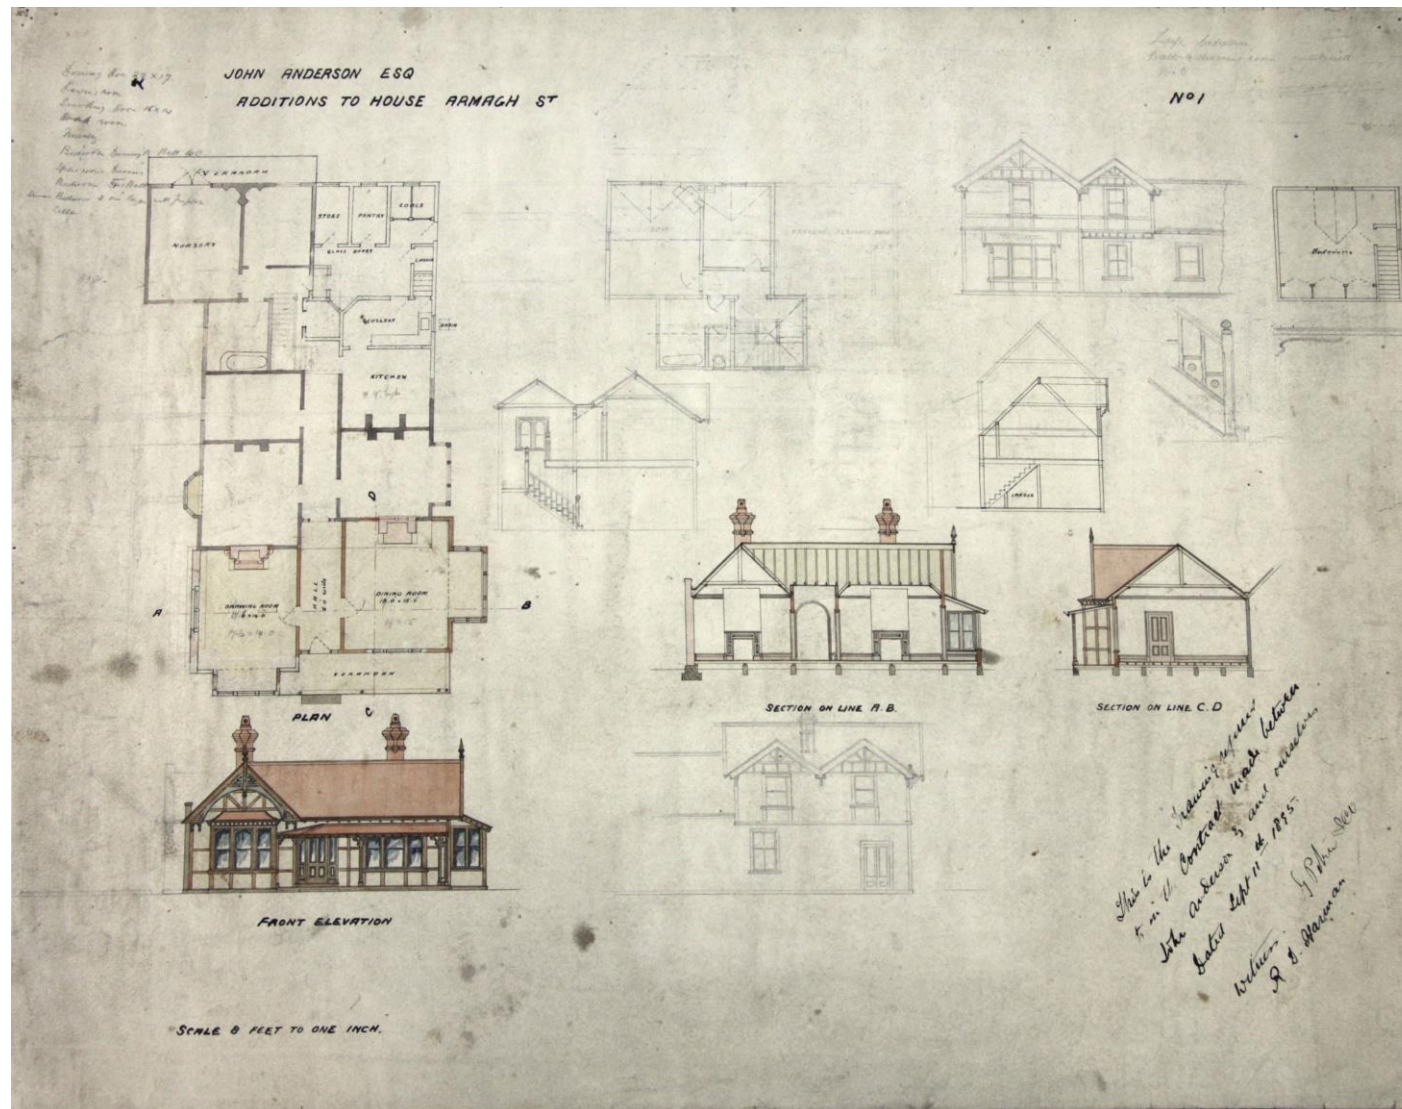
Collins and Harman, John Anderson, Esq., Additions to House, Armagh St., plan, elevations and sections (1895).
